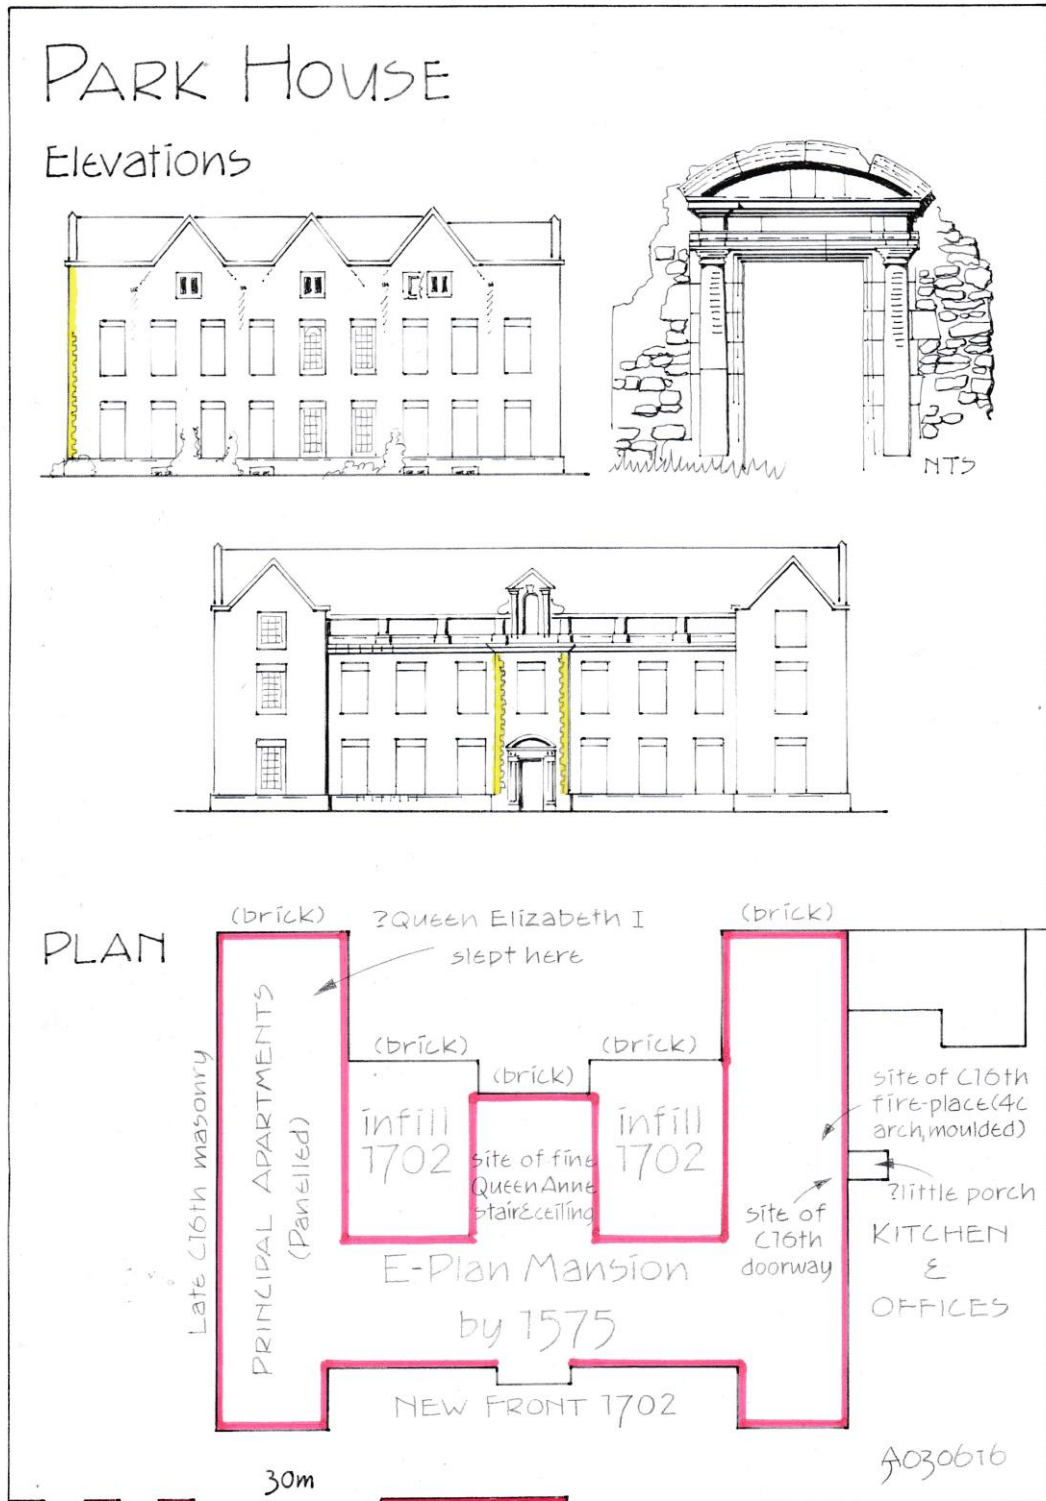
; the mansion, based on cartographic and photographic sources. Pink; the Elizabethan house, Yellow; stone-quoins associated with the 1702 brick rebuild.
